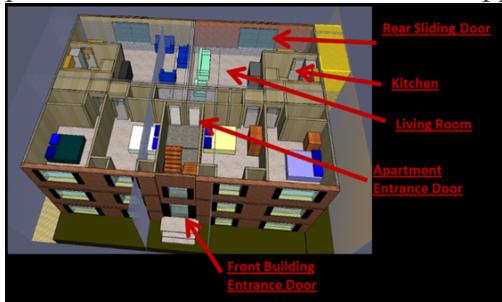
A typical floor plan of the right-side apartments at 30 Dowling Circle.
